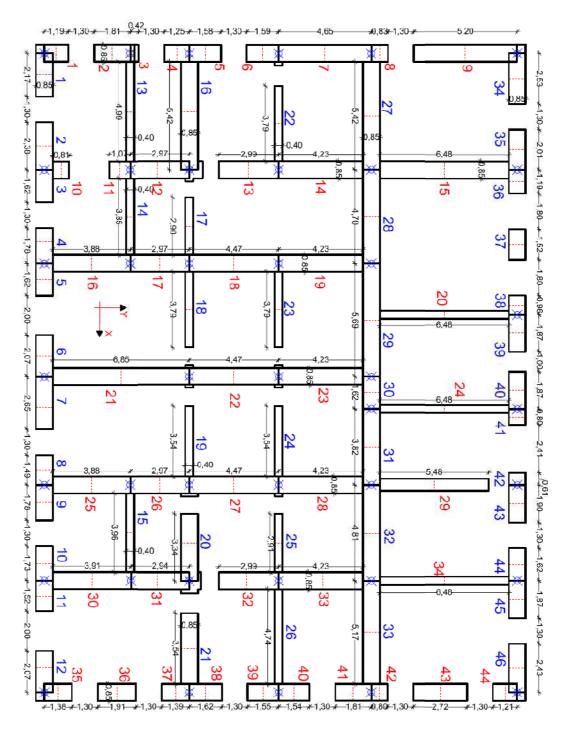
Structural plan BT"A". Ground Level (+4.15 m).
